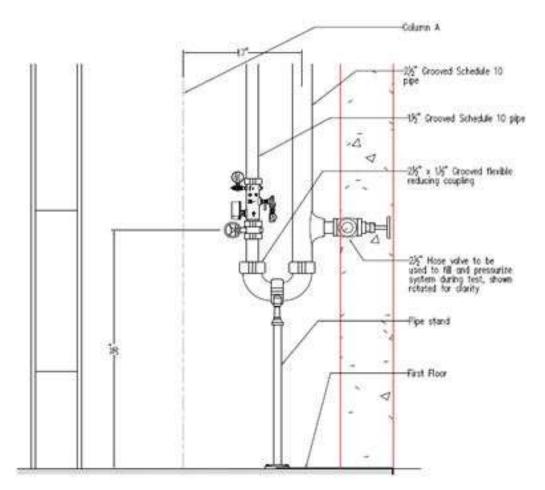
Floor 1 control assembly detailed drawing (looking north)
